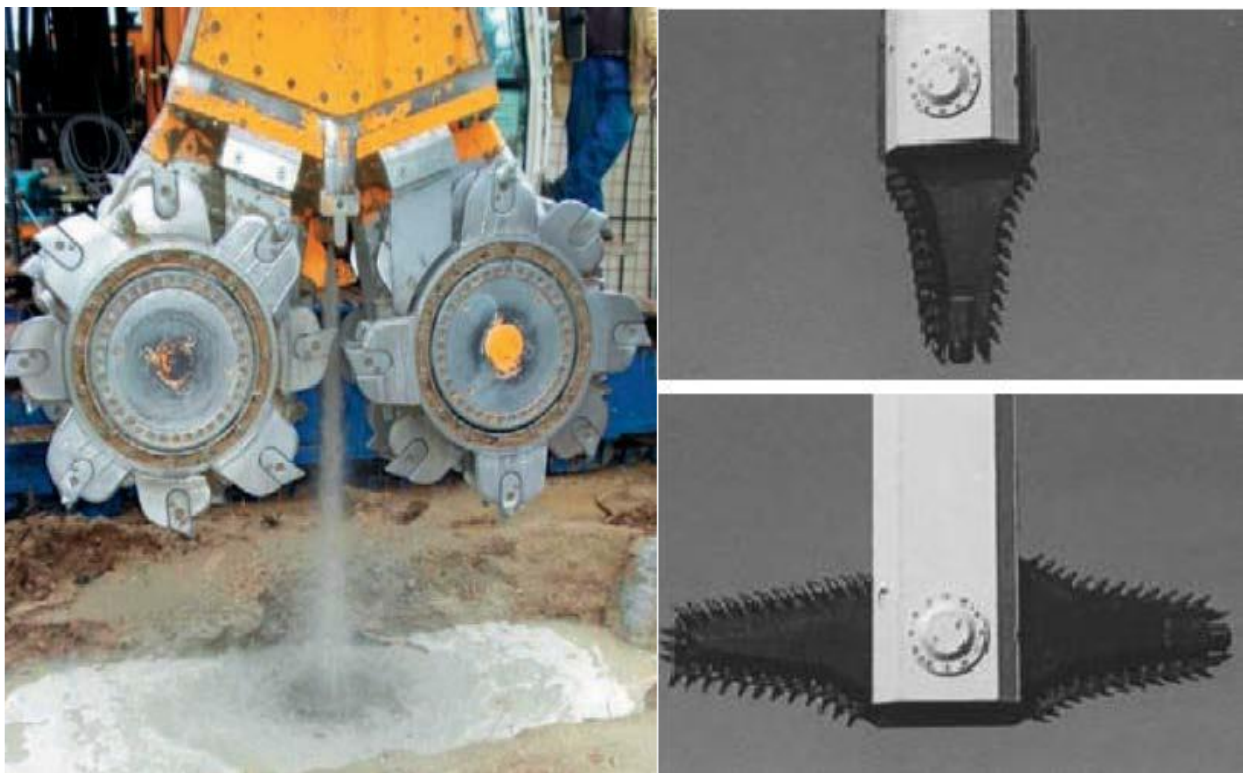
Examples of multi augers tools: a) cutter Soil Mixing by Bauer (Caltrans, 2010), b) blade used in Spreadable Wing method by SWING (Topolnicki, 2004)
